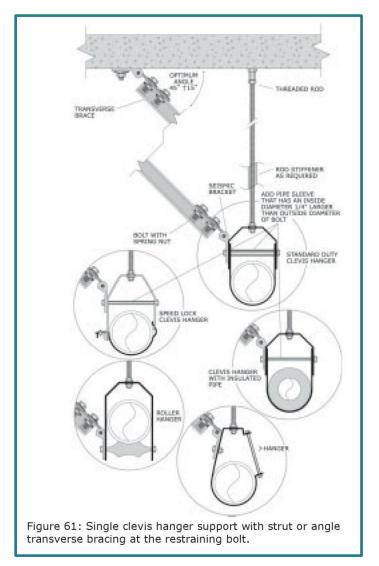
Single clevis hanger support with strut or angle transverse bracing at the restraining bolt.
